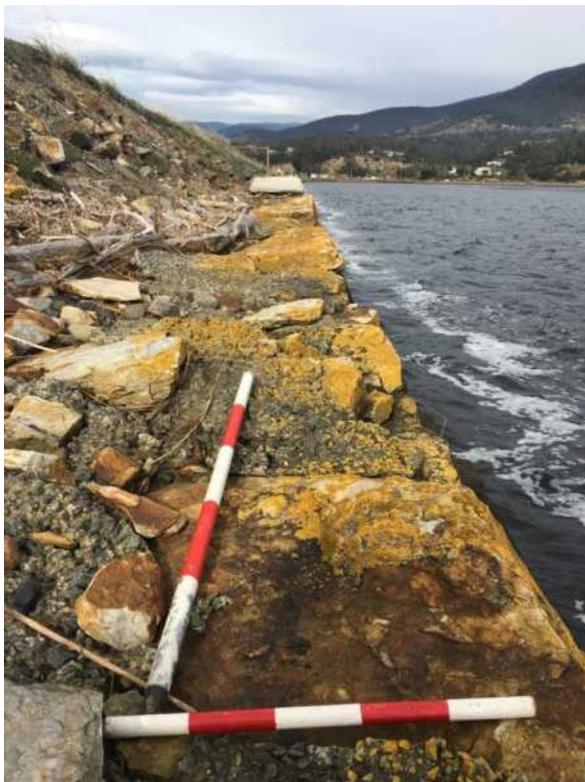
Western side of causeway, below the rail line, showing the sand and mudstone retaining wall [2], with crudely poured concrete on top, looking south.
